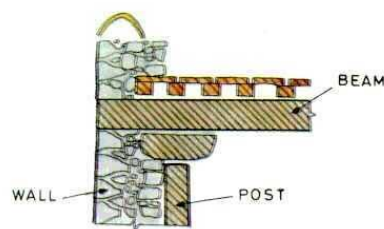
A: Critical Structural Details - Wall-to-Roof Connection
